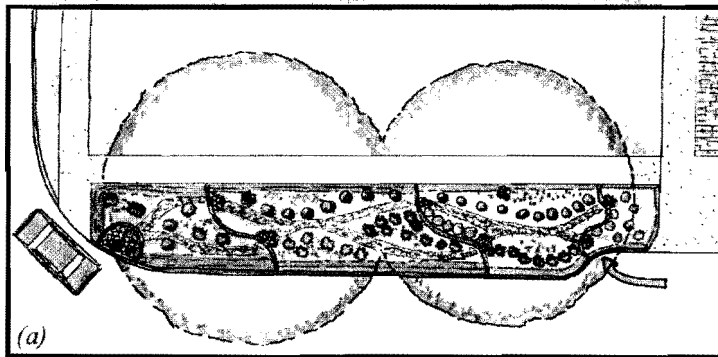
a. b 114th Street Curb Bumpout Detail
